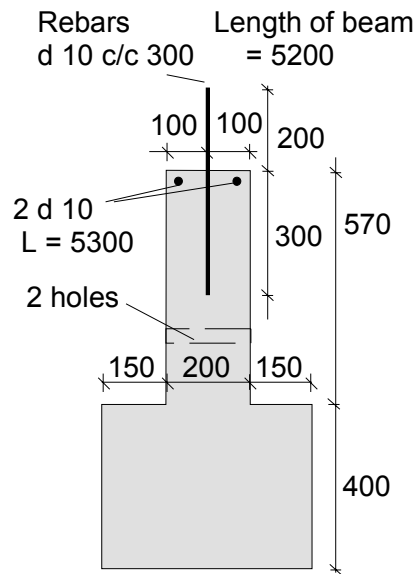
Design of supporting beams. The grade of concrete was K30.
